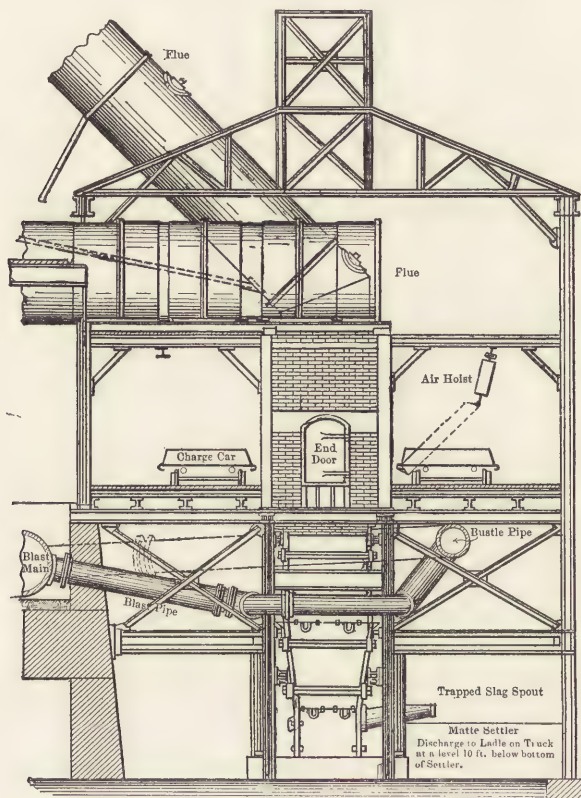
CROSS-SECTION OF FURNACE BUILDING AND END ELEVATION OF 56x612-IN. BLAST FURNACE.
